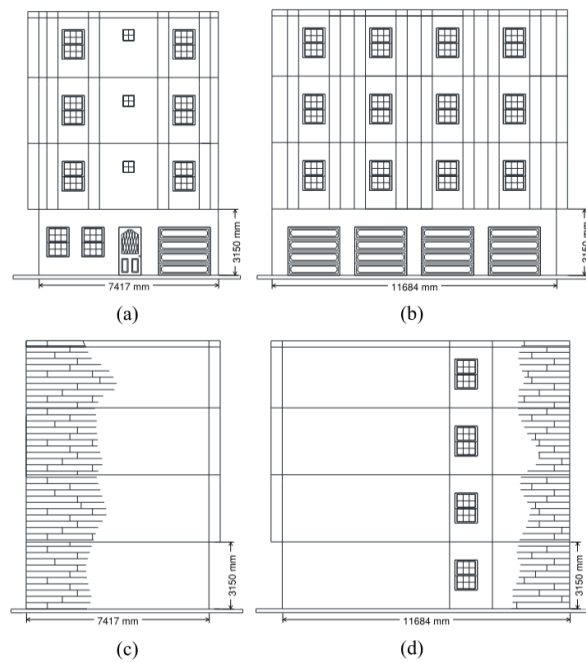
Elevation views of the four-story wood framed prototype building [4]:
